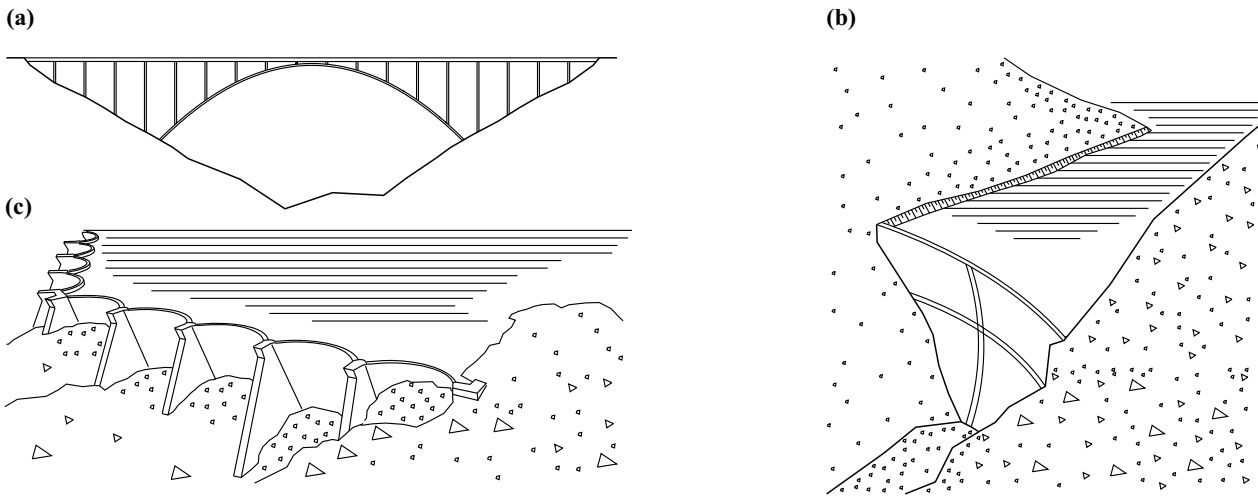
Arches: (a) bridge, (b) dam, (c) retaining wall, weir
